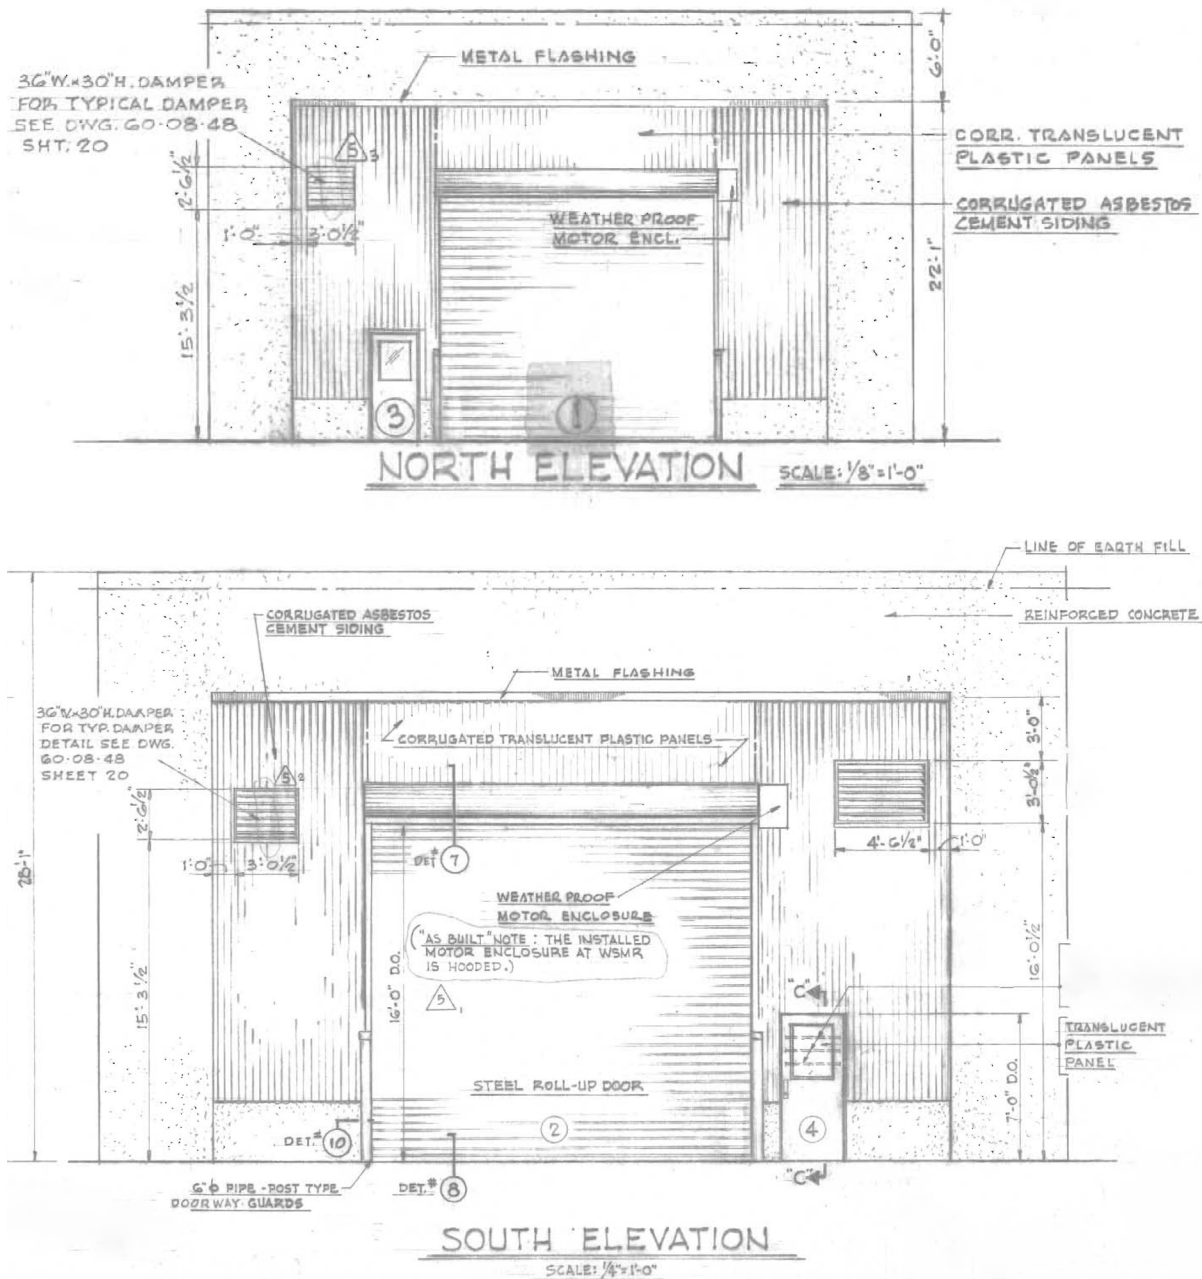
Property 23656, north and south elevation drawings from 1959 WS-IA plans.
